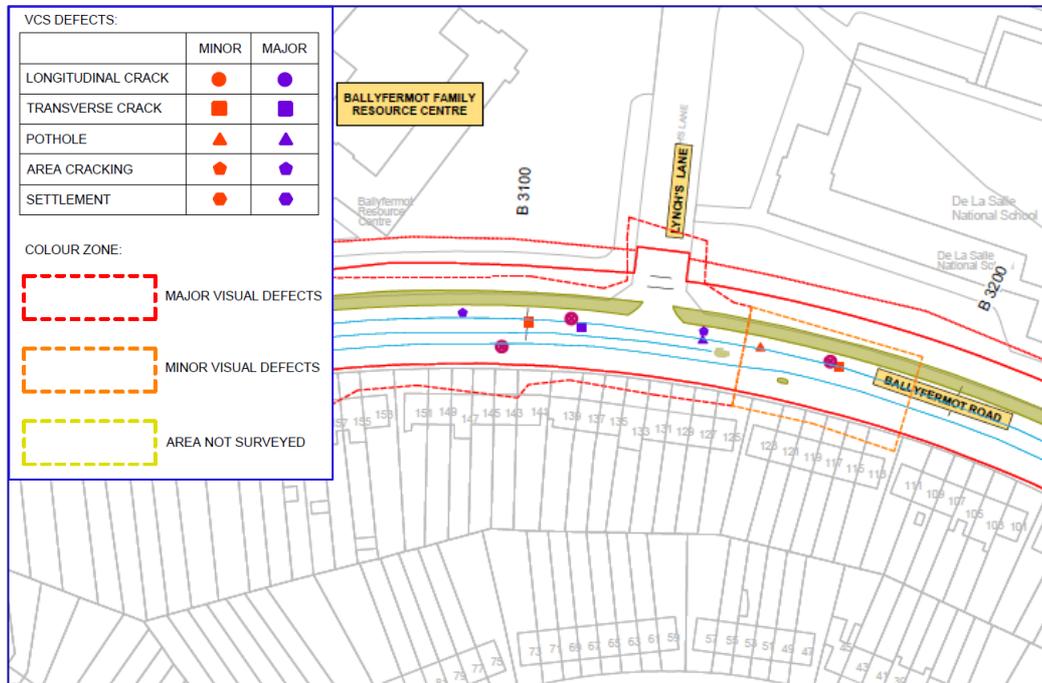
Example Ranking of Pavement Condition and the Type and Location of Defects Observed
